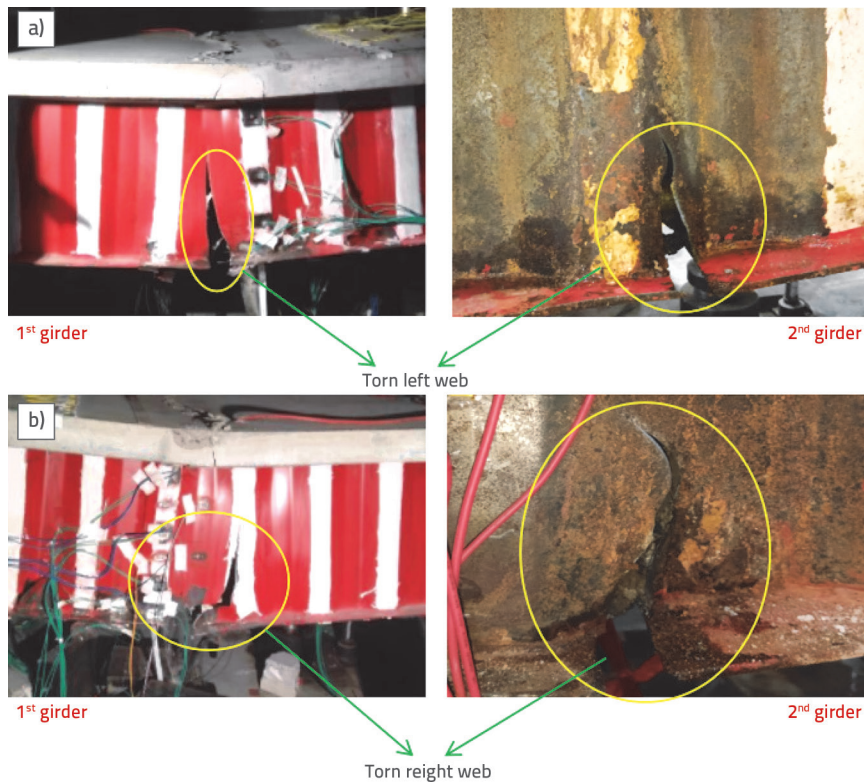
Test girder failure patterns: a) Left web crack; b) Right web crack
